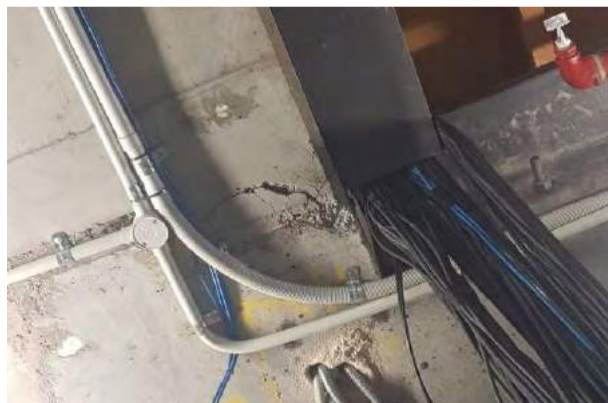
Minor cracking on underside of new concrete slab
